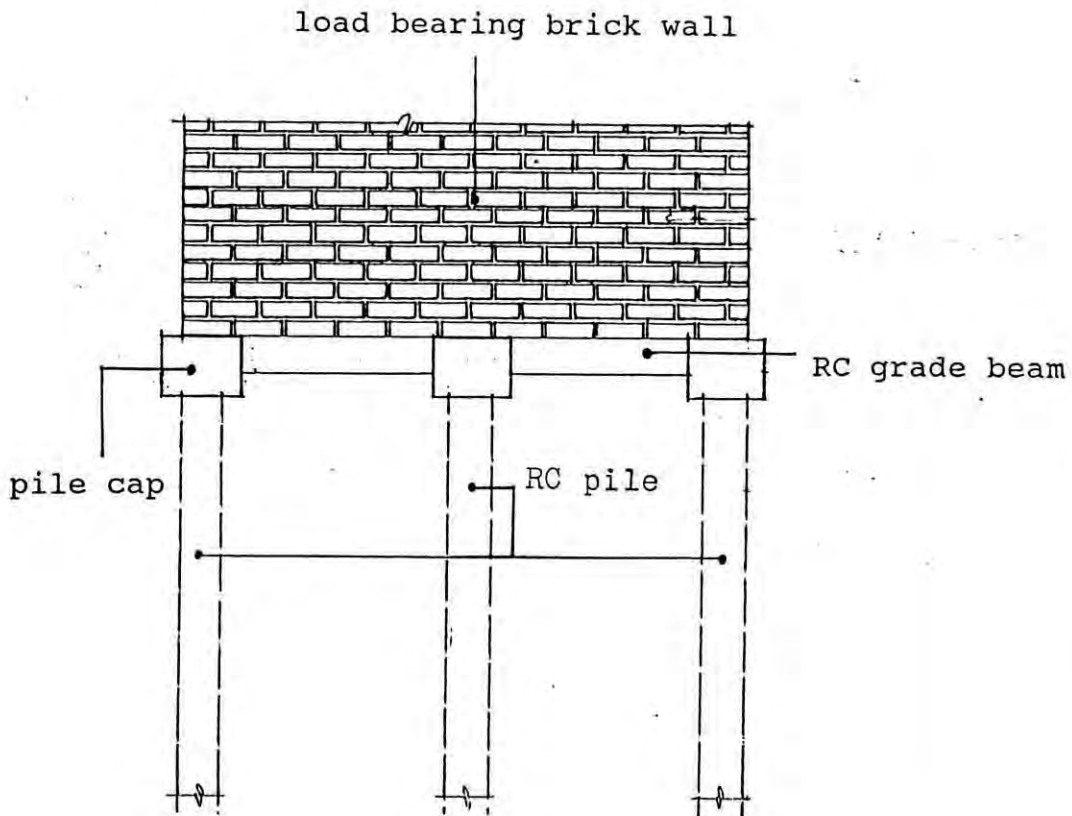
Load Bearing Brick Wall Over Reinforced Concrete Grade Beam
